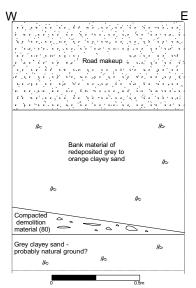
South facing section seen below roadline Station Road (Site 4)
